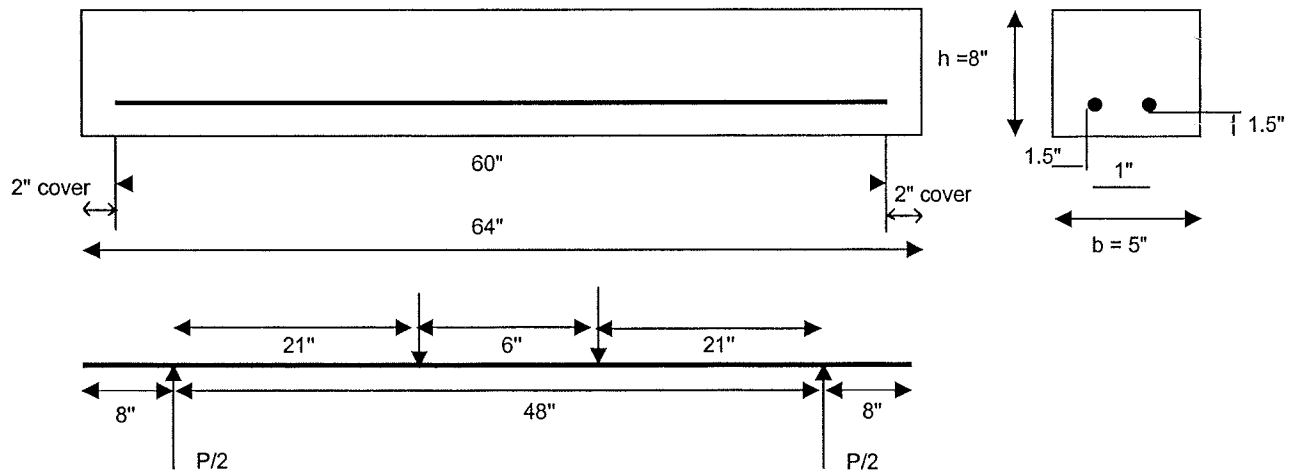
Details of reinforcement position and testing arrangement (BRC-1).
